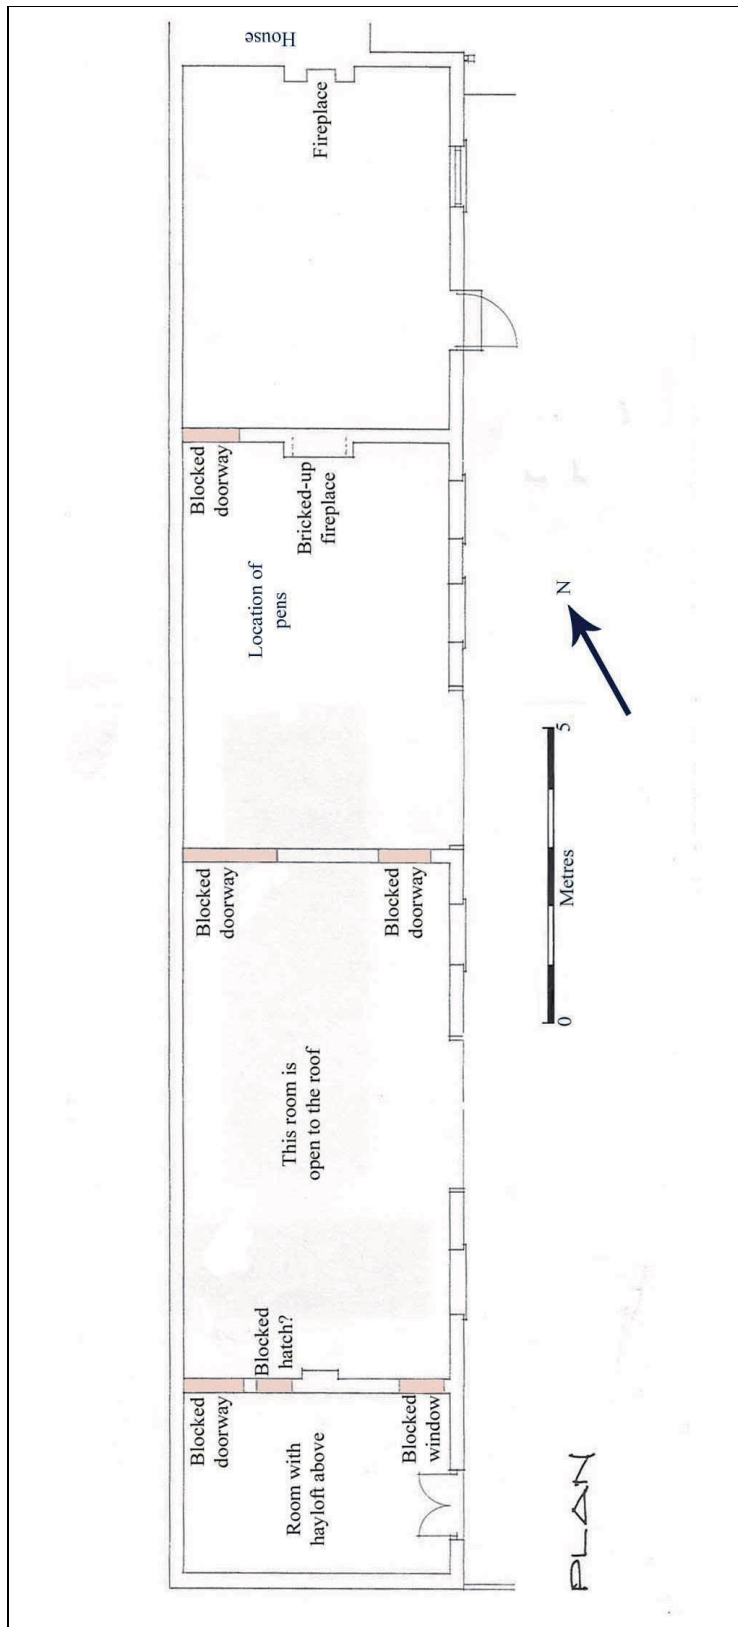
Ground plan of building at Thorncliffe; blocked doors, window and hatch are shown coloured pink
